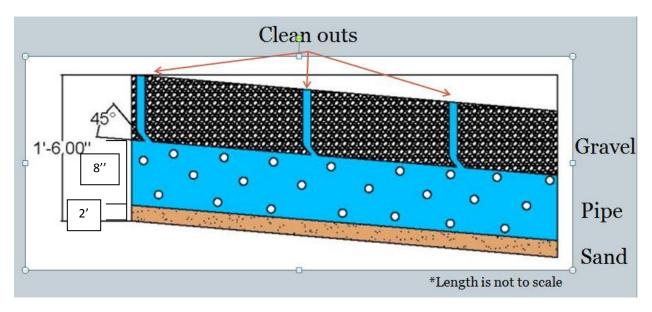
AutoCAD drawing of the profile of the French Drain (dimensions in inches and feet). Length is 210 feet. Sweep T's will be placed every 70 feet. Pipe will be perforated. Filter cloth will surround the pipe, and perimeter of the French Drain trench.
